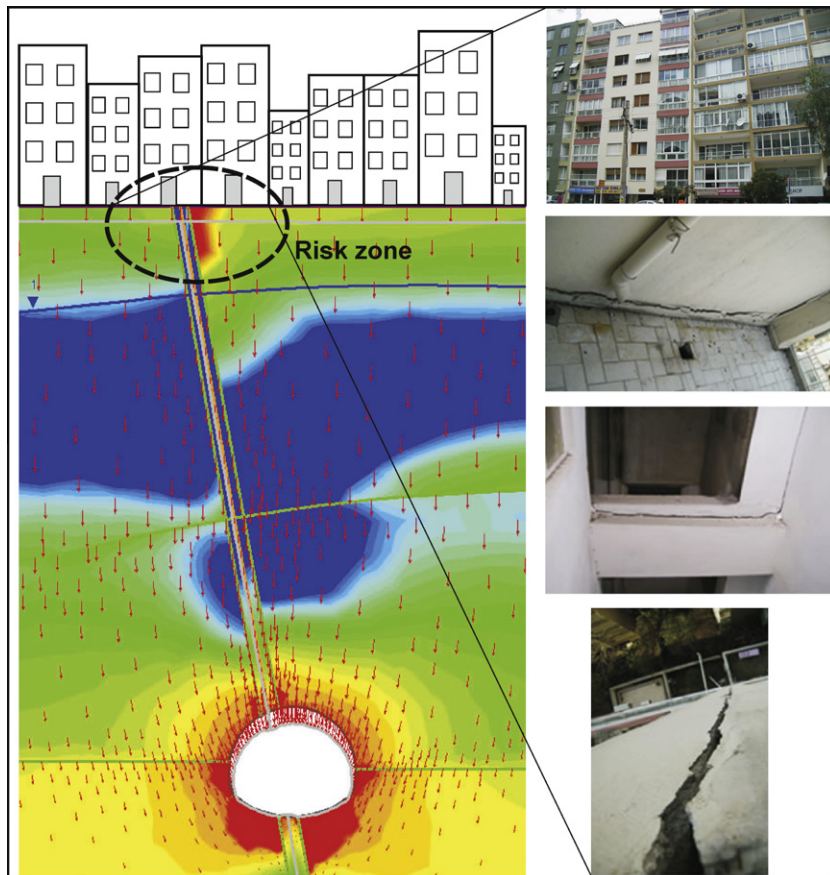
Damages observed on the ground structures at tunnel-fault zone transition.
